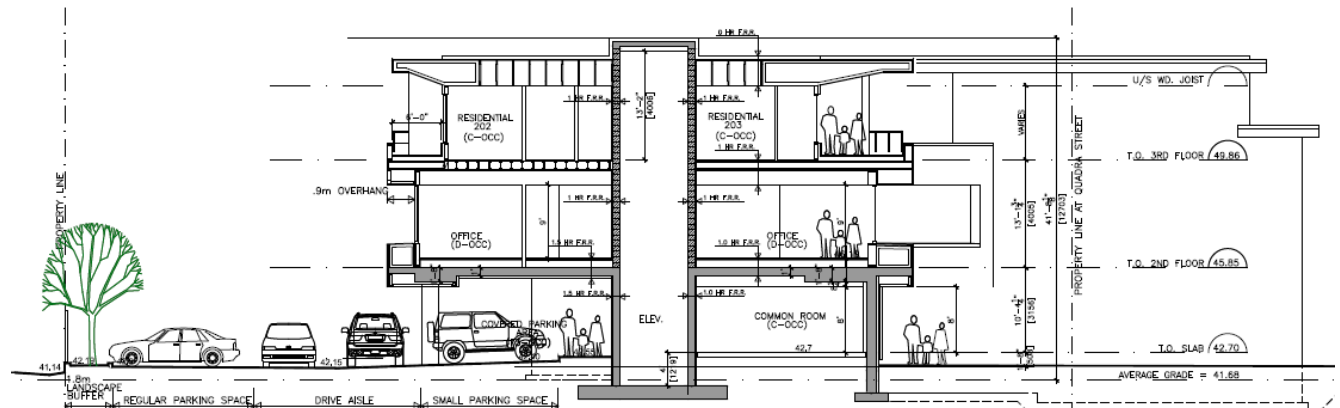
North/South Building Section- from plans by O.C.A. Architecture Inc.
